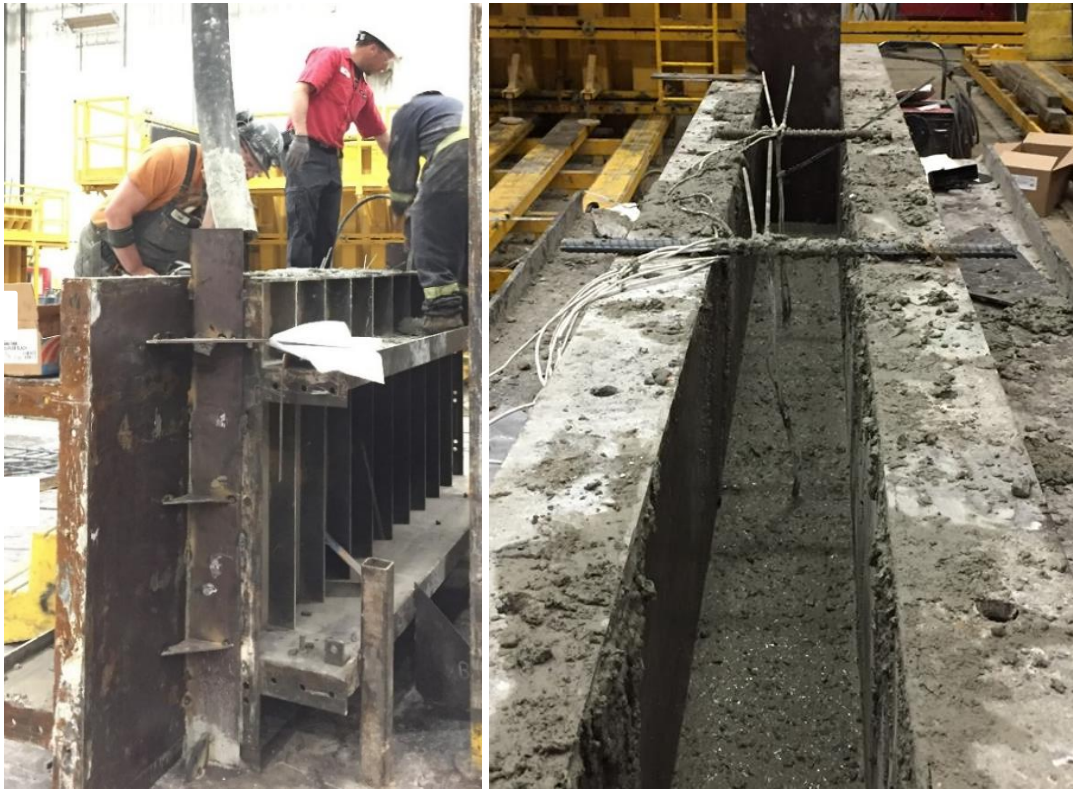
G2 Formwork and Fresh Concrete in Form
